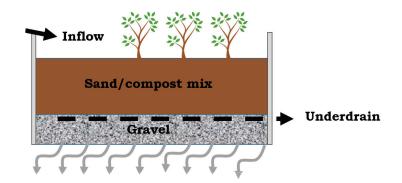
Bioretention Facility. The NPDES permit specifies the use of, and design criteria for, bioretention facilities to treat stormwater.
